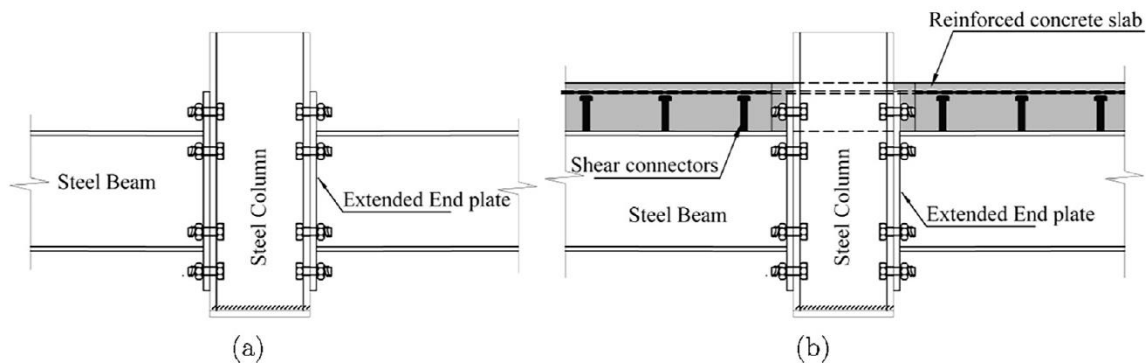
7 Typical extended end plate joints (a) bare steel, and (b) composite joint (Ataei, 2019).
